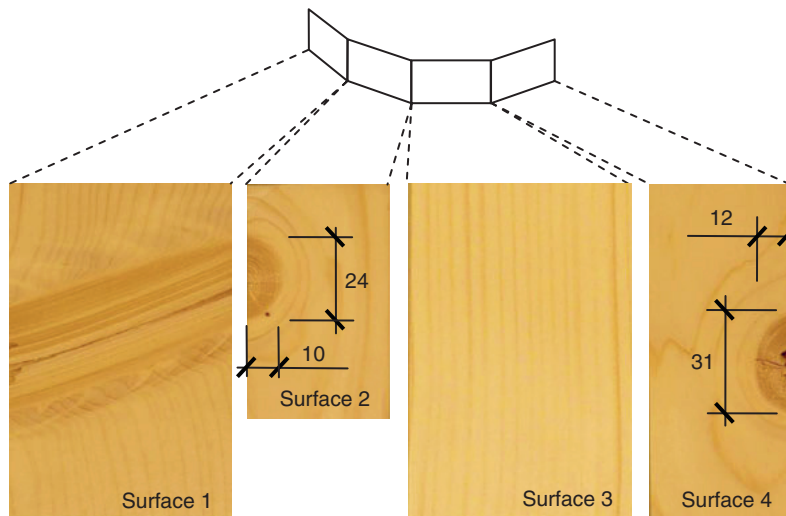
Knot dimensions (mm) in Edge knot specimen
